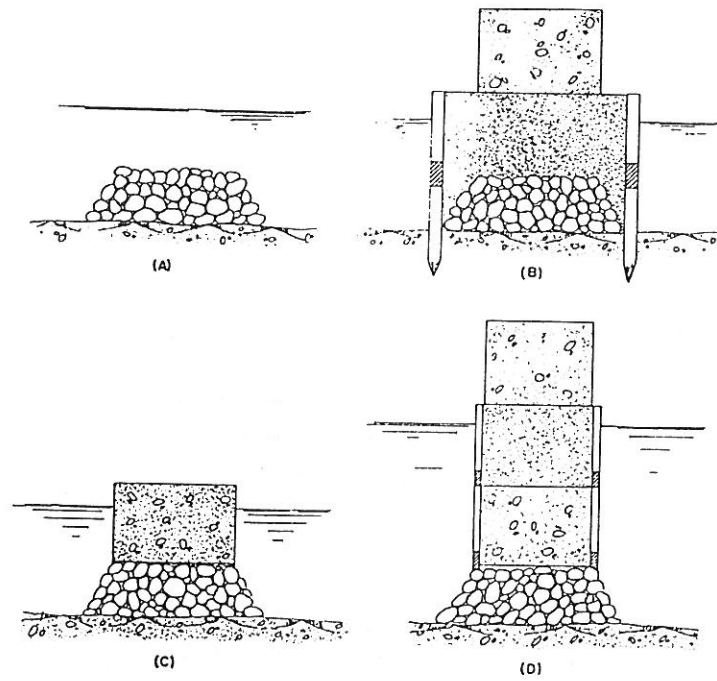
Cross-section of different construction steps for concrete blocks vertical breakwater (de la Peña, Prada & Redondo '95, according to Vitruvio (5-13))
